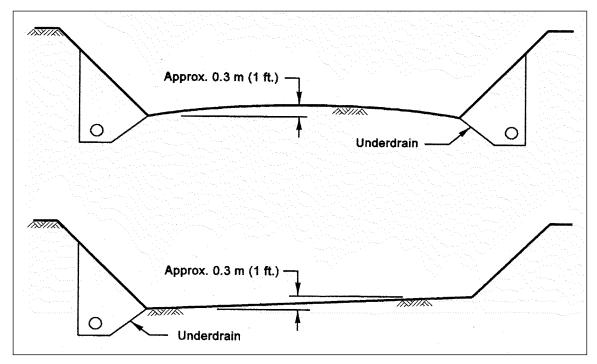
Bottom Configurations with Side Bank Underdrains
